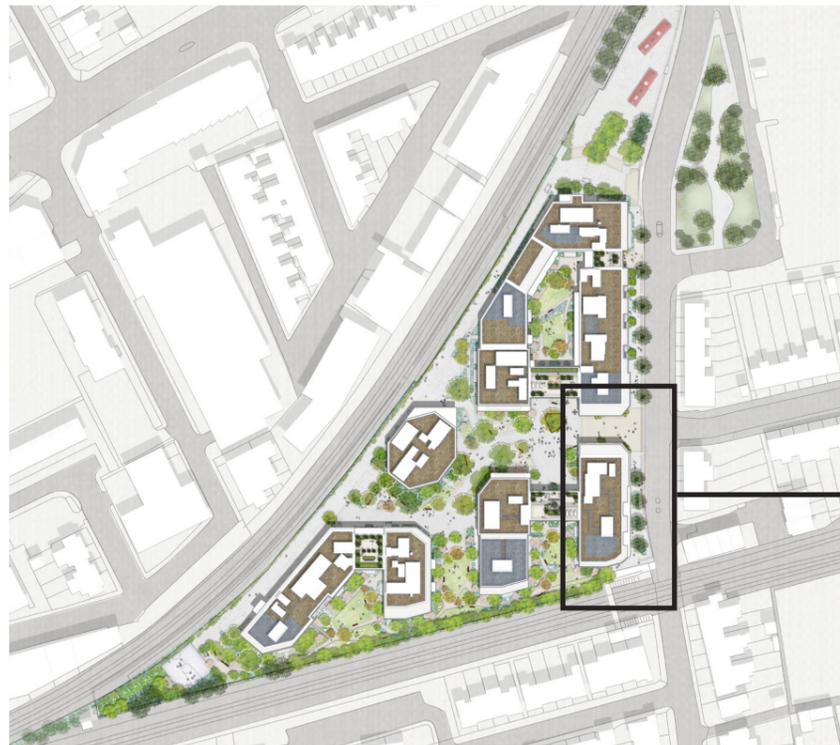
DETAIL OF BLOCK A STREETScape- NOVEMBER 2021 AMENDMENTS
